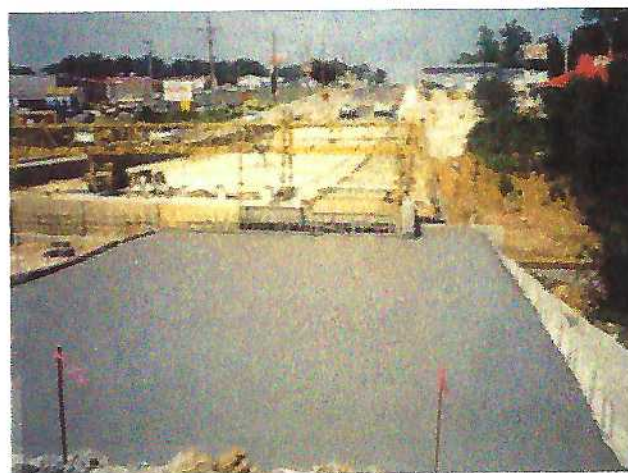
Geotechnical roadway base at bridge approach.
